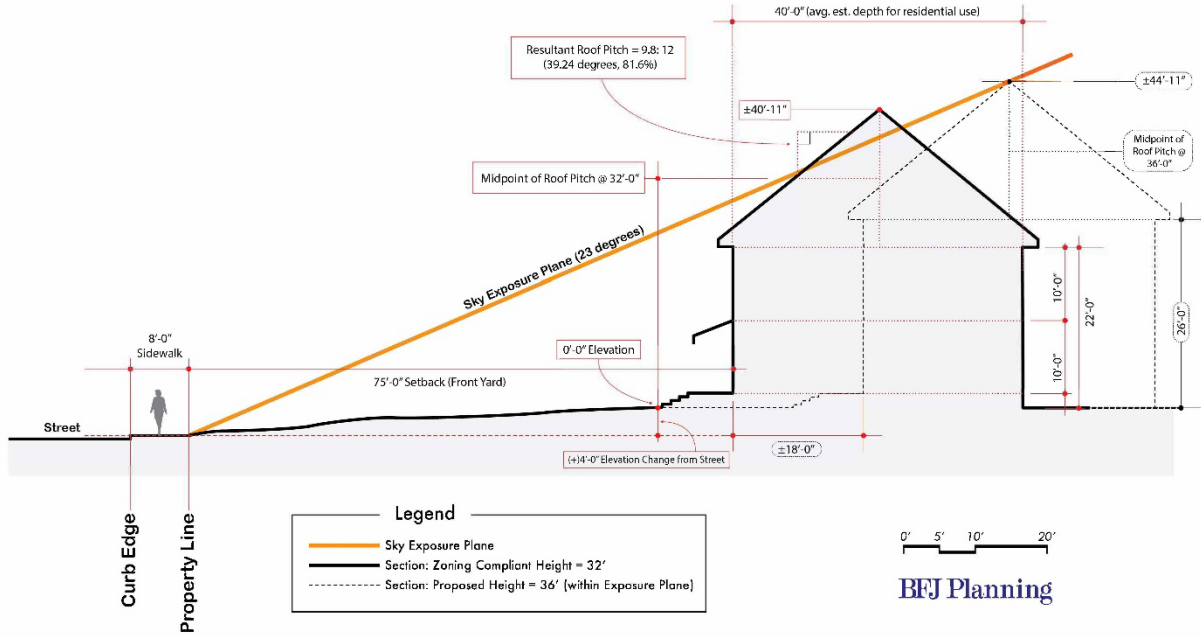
AA-1 District Sky Exposure Plan Analysis- Elevation Incline
